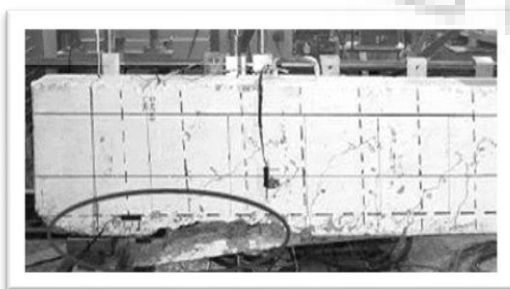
Rip-off failure of control beam Fig 2.3 Peel-off failure of the strengthening beam
